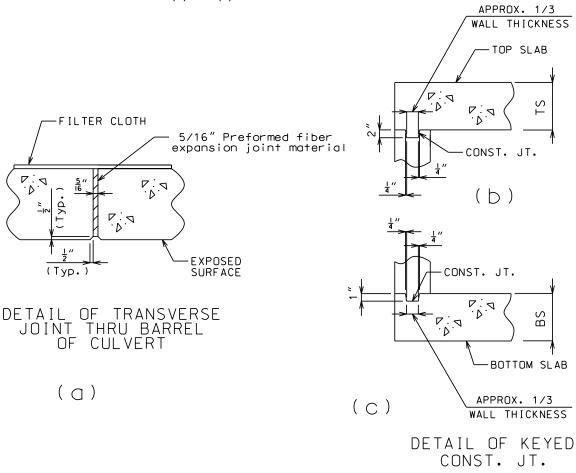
Typical detail of joints (a) transverse joint (b) keyed construction joint at top slab (c) keyed construction joint at the bottom slab
